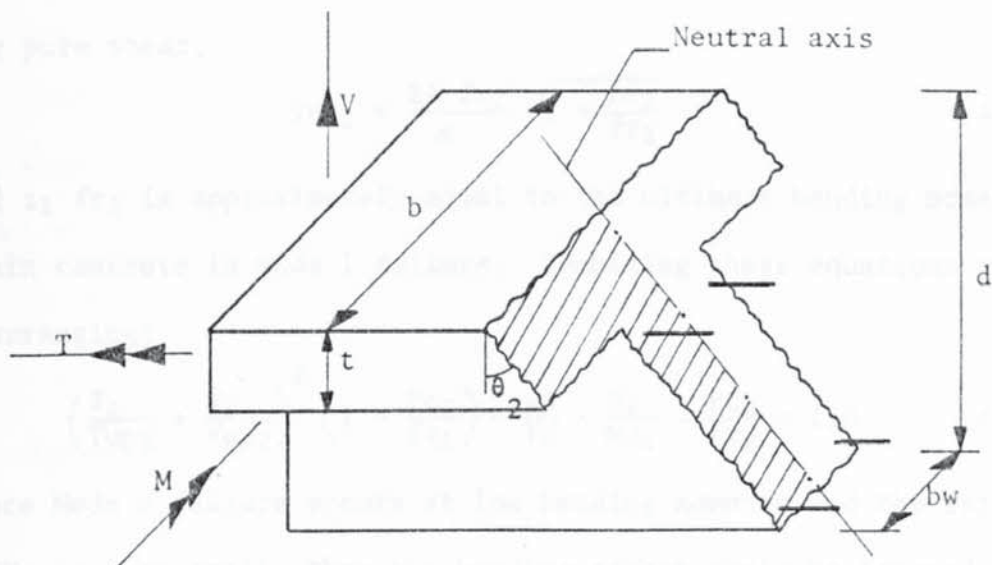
MODE TWO FAILURE IN PRESTRESSED CONCRETE T-MEMBERS UNDER COMBINED LOADING
